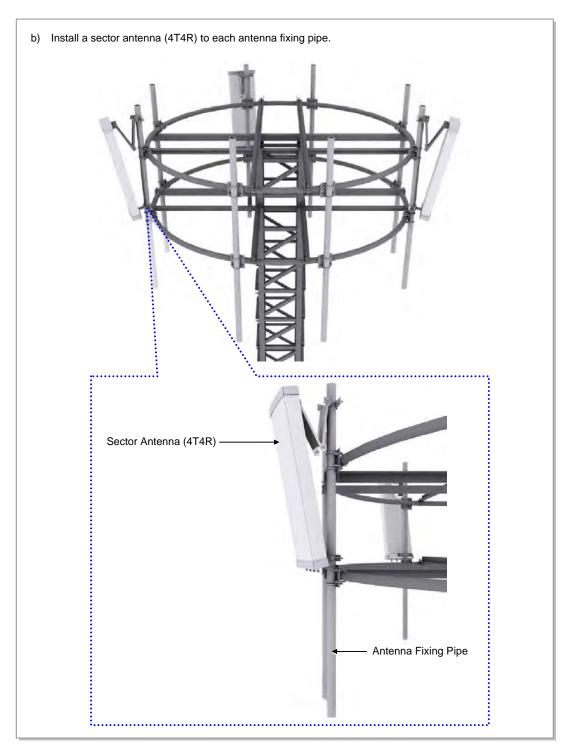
Fixing Tower Type RRH-2WB (8)
